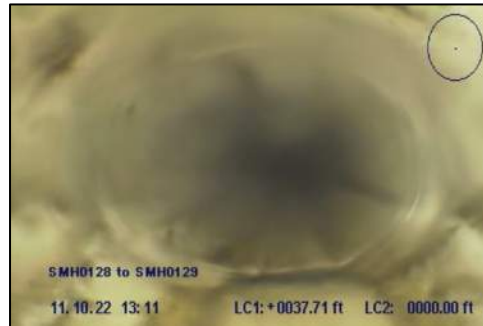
Deformed flexible elliptical pipe at STA 0+38
